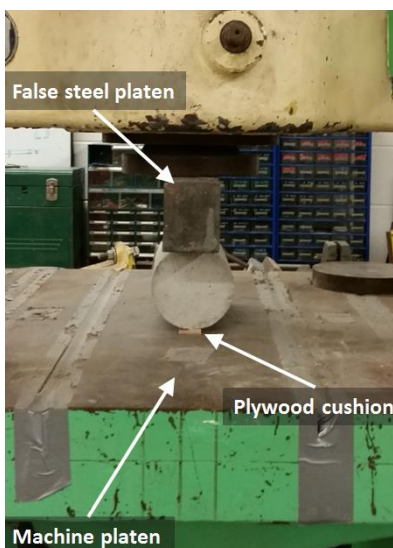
STS test specimen setup on Baldwin Universal testing machine
